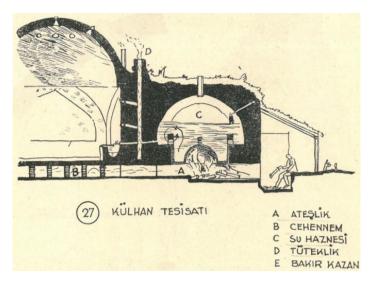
Water storage and heating system of Turkish baths (Source: Aru, 1941)
